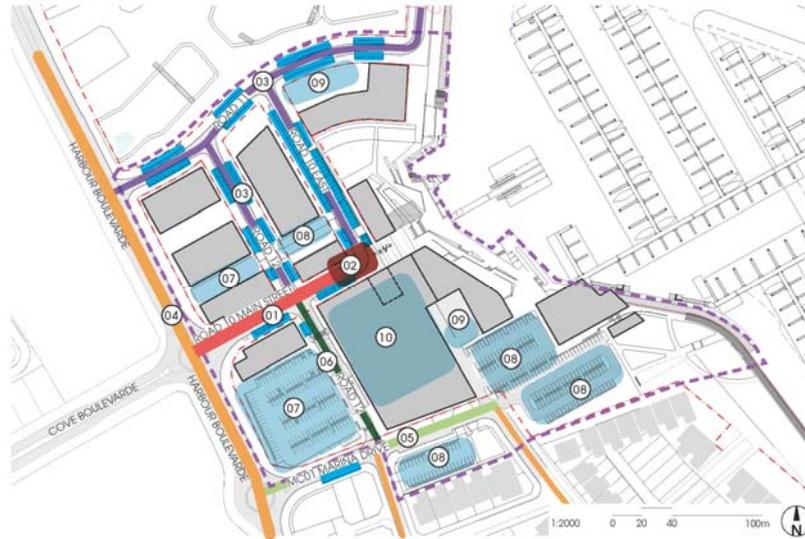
Precinct D - Indicative Street Network and Parking Plan
